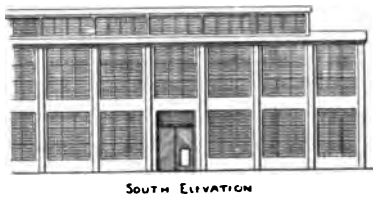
SIDE ELEVATION OF ERECTING SHOP, BROOKS
